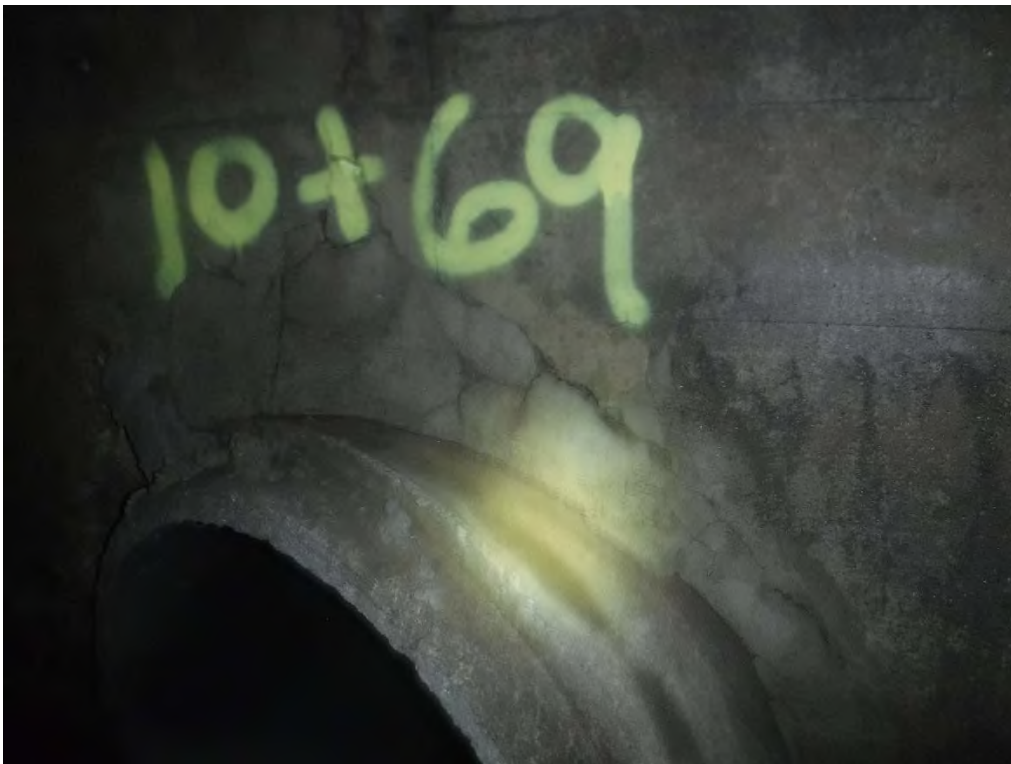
STA. 10+69, 30" concrete. Recommend grouting connection.
